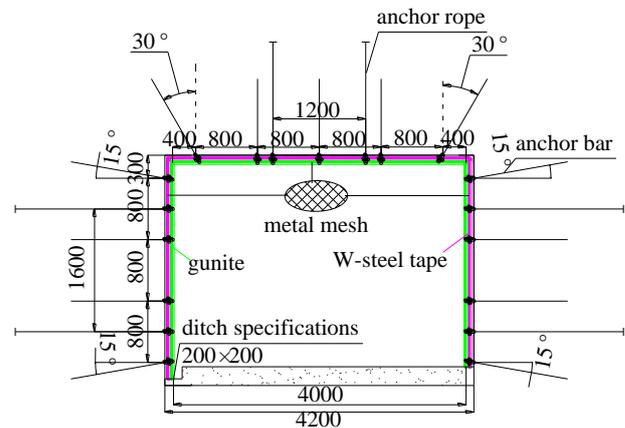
Schematic diagram of roadway support scheme (unit: mm).
